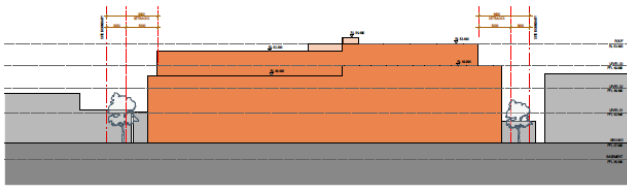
Proposed southern elevation (massing only) of Concordia Building.
